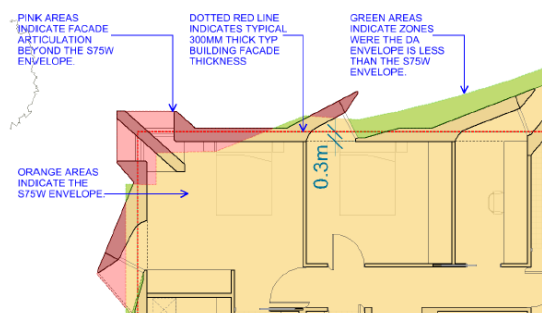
Overlay diagram of the S7SW Concept envelopes with the proposed detailed DA design (NW corner of Building D).
